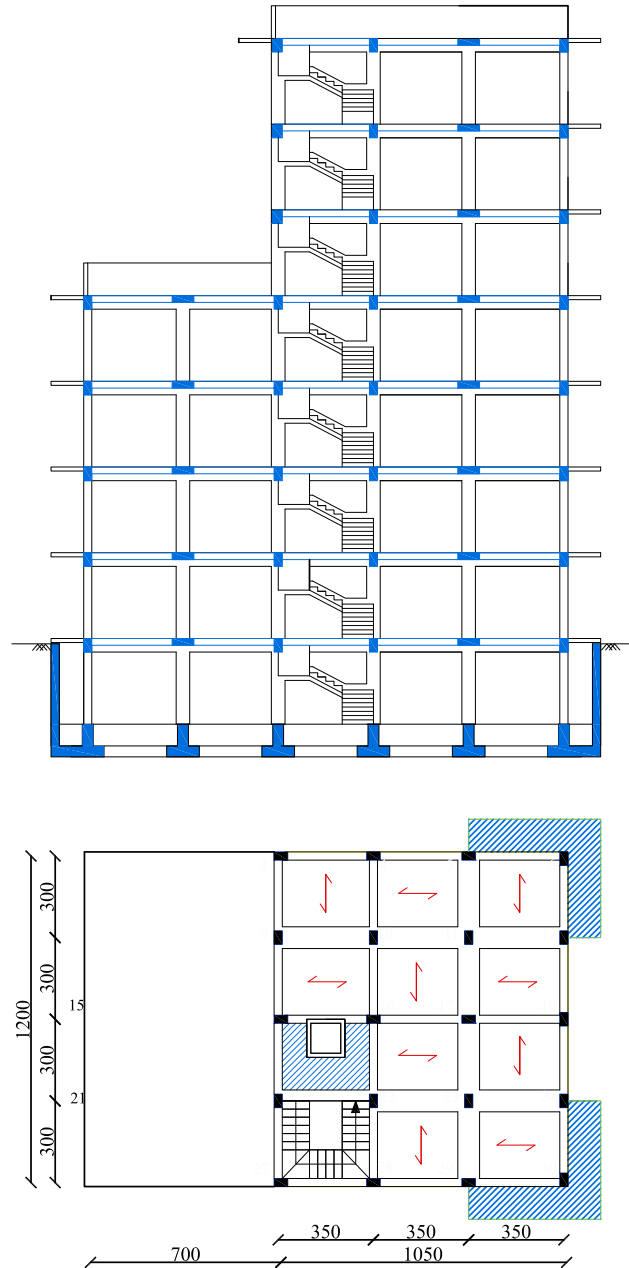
Building irregular in elevation: plan of the taller part and vertical section.
